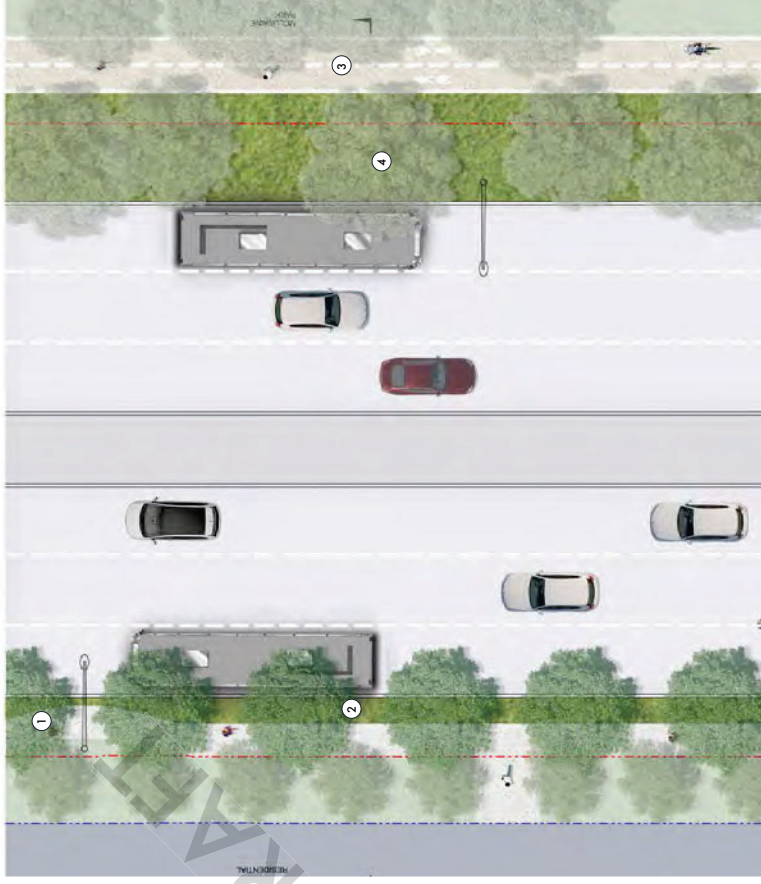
Concord Road South (McIlwaine Park) - Typical Plan
